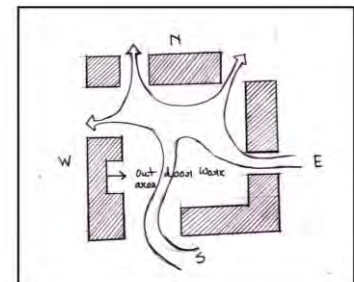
Open space and Lay out: plan shows Space between enhance airflow.
